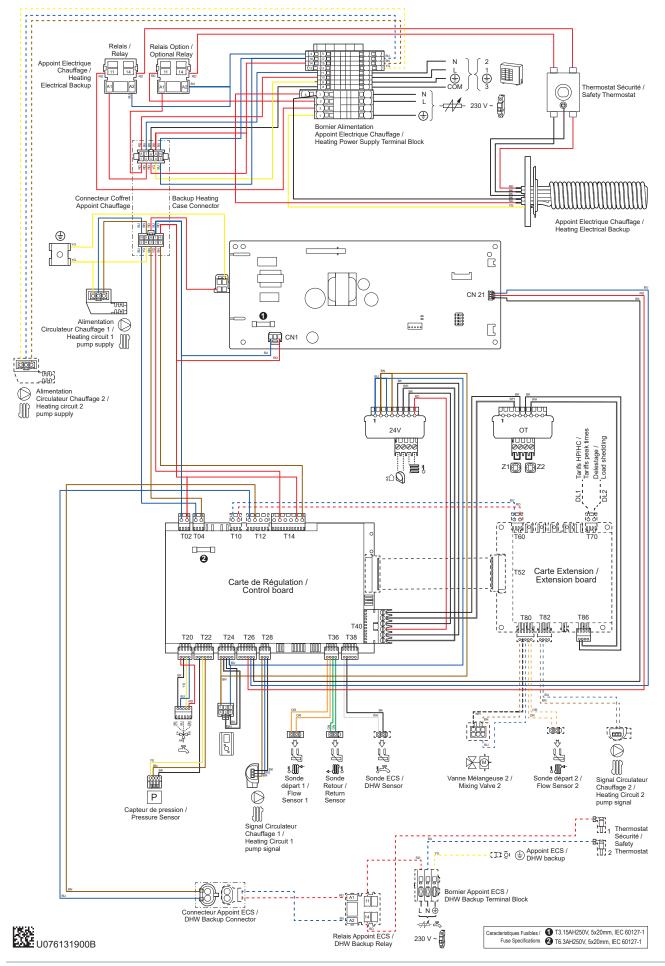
Electrical wiring Hydraulic module (excluding installer connections)
